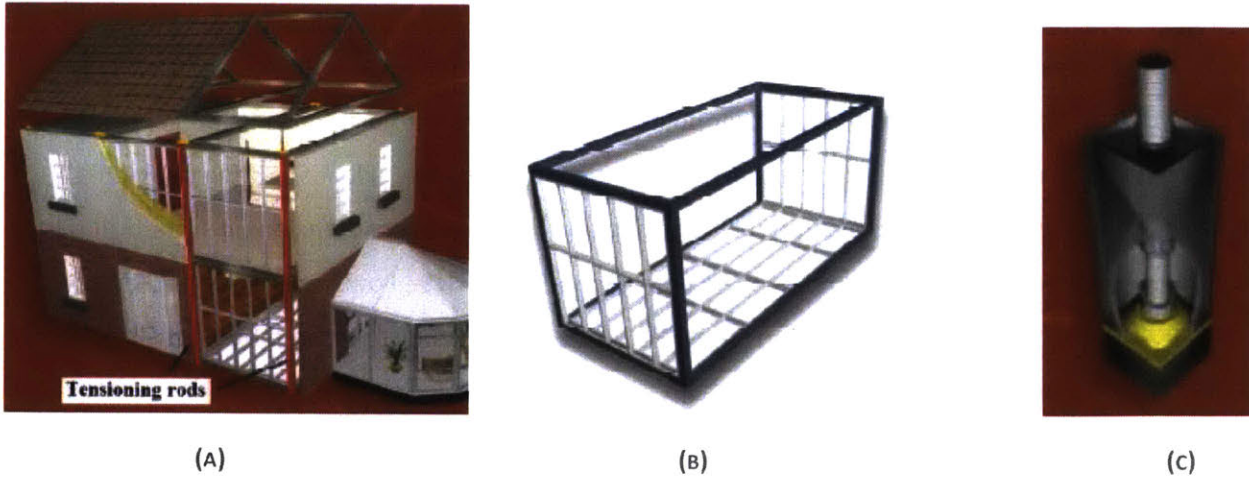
(A) POST TENSIONED POWERWALL HOUSE (B) INDIVIDUAL MODULE (C) PT CONNECTION (ZHENG ET AL. 2012)
